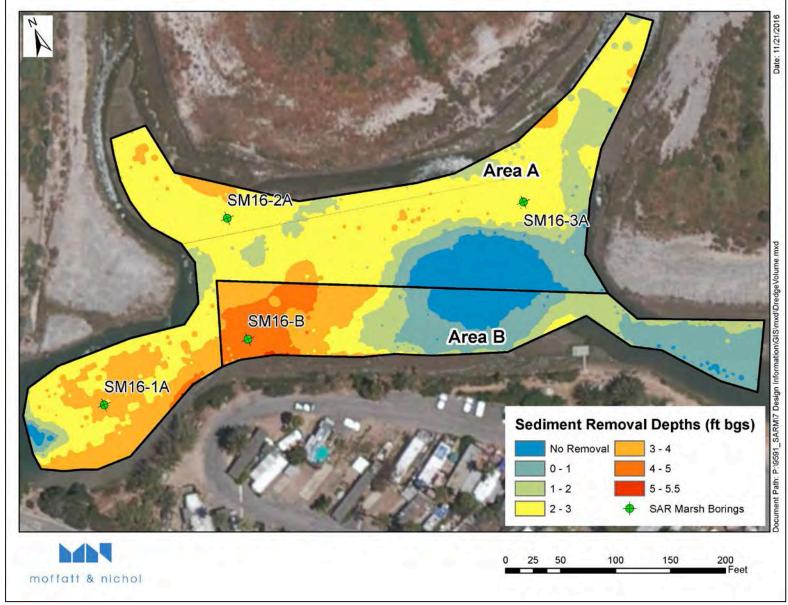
Excavation Depth from Existing Grade to Design Elevation (ft bgs)
